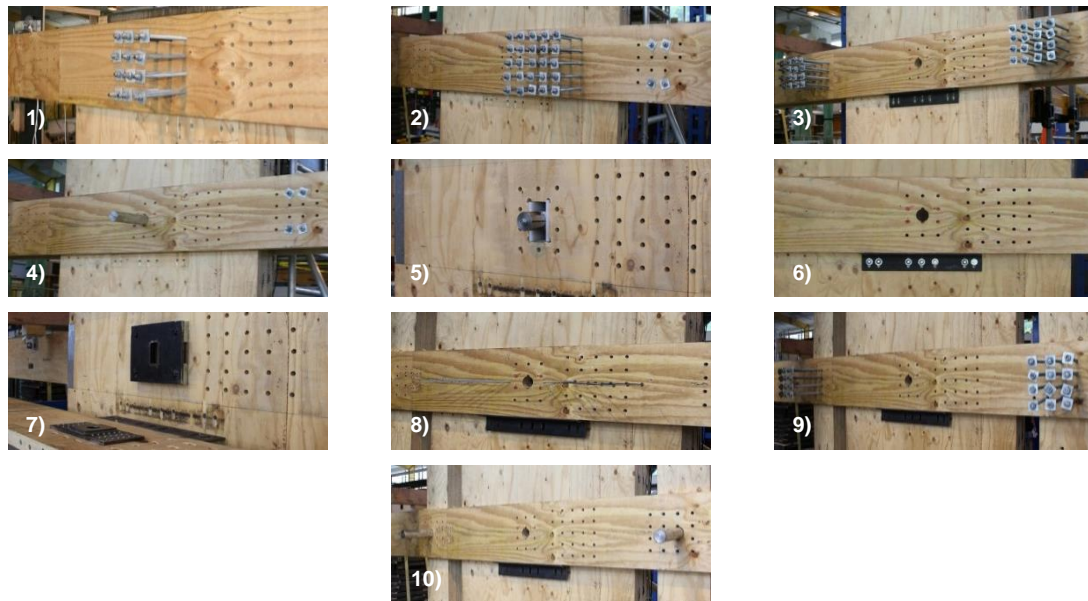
The ten tested connection details between the collector beams and the wall (1-8) and columns (9-10) respectively
